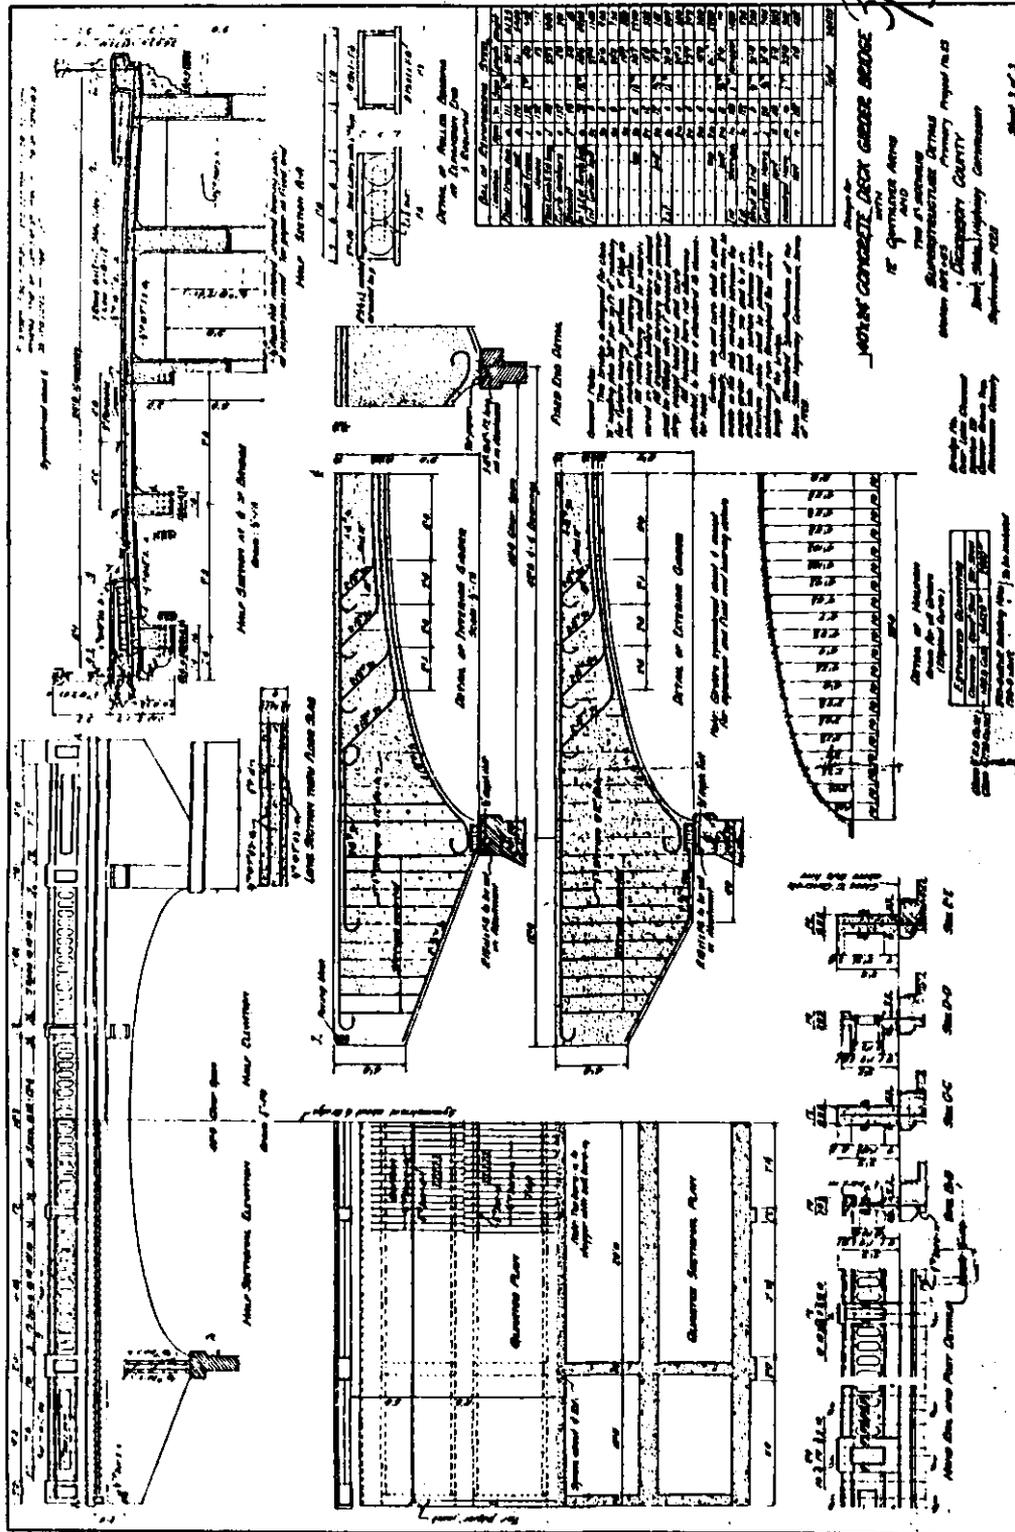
Construction Drawing for Okoboji Bridge, Iowa State Highway Commission, September 1928.
